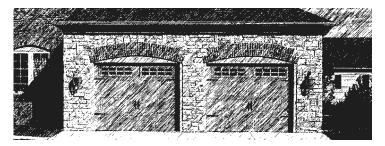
Arches are an acceptable method for reducing the dominance of the wall area above garage doors
